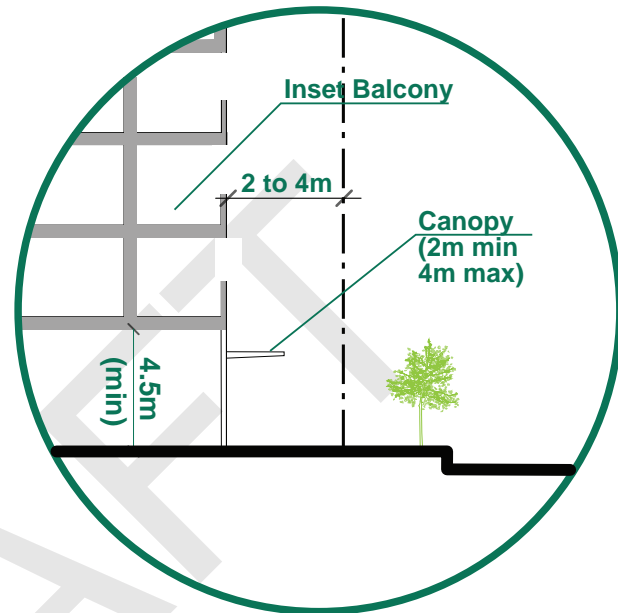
Ground floor conditions on all A - Streets. Balconies should be inset and any canopy projections should be between 2 and 4 meters.
